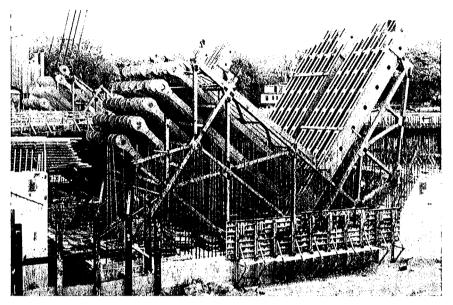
Supporting frame and eyebar chains, Verrazano Narrows Bridge, Brooklyn, N.Y.
